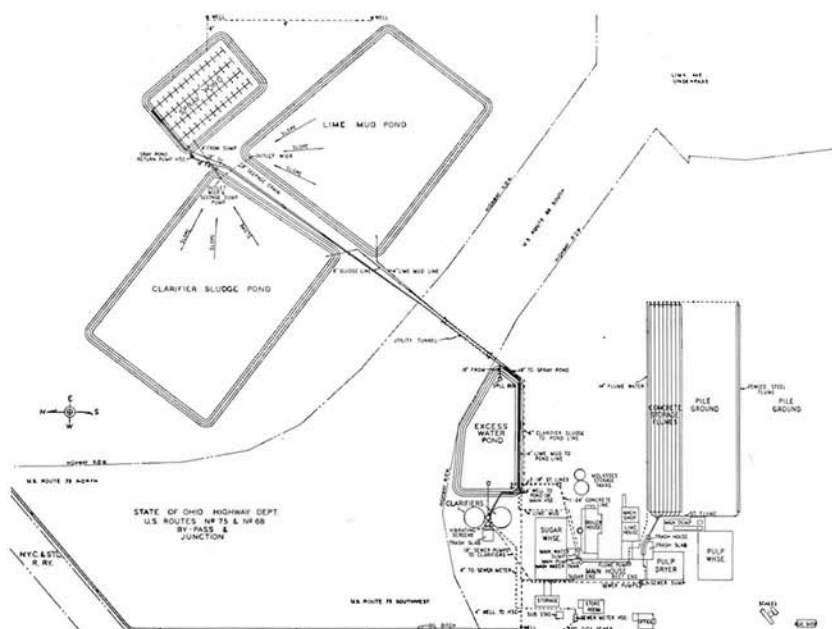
General plan of water and waste system, Findlay, Ohio, plant, Northern Ohio Sugar Company.
